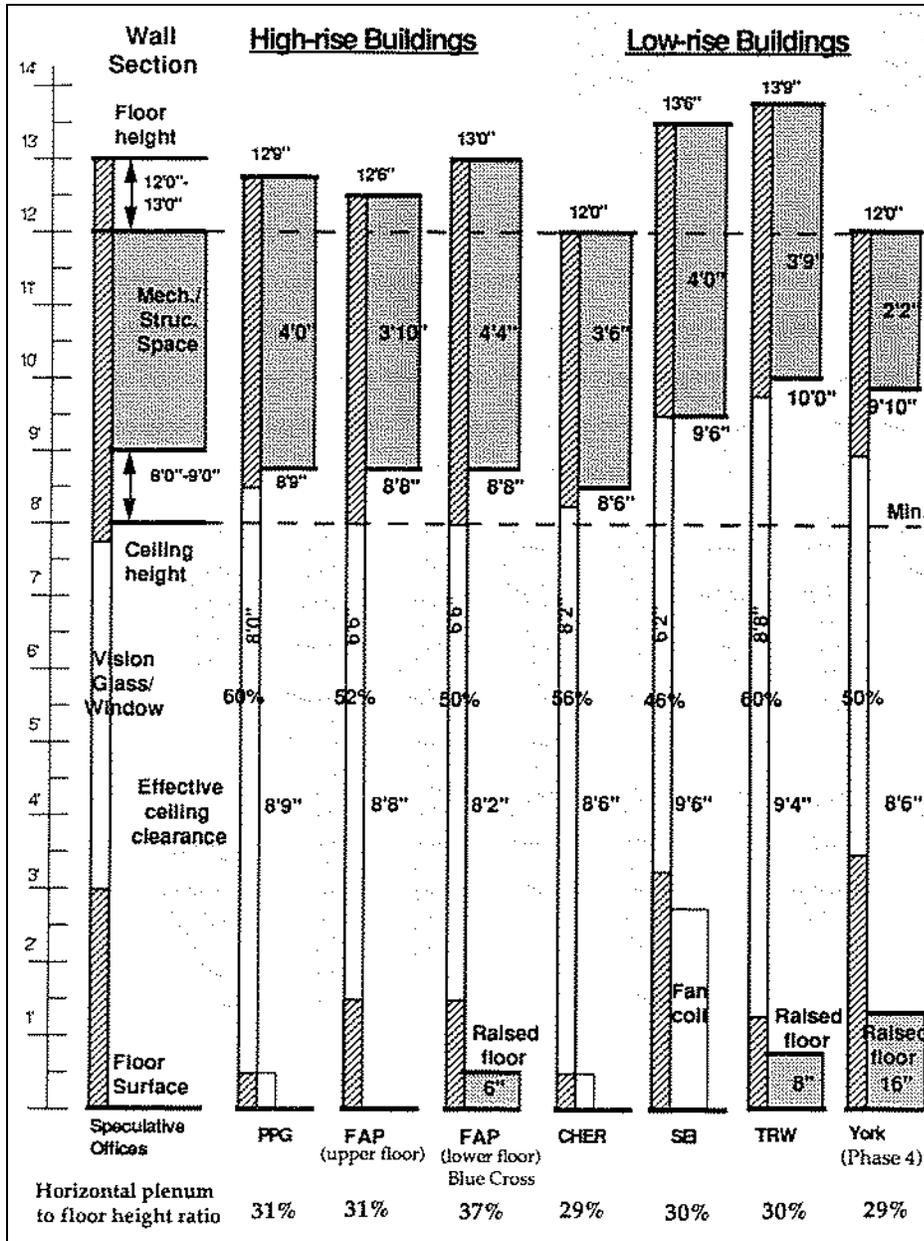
Effect of a raised floor on building floor-to-floor height (Chiu, 1991).
